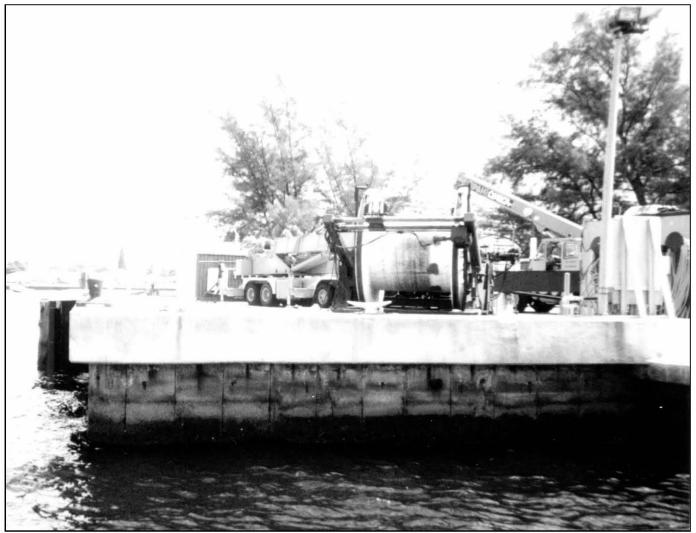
Example of Standard Vertical Concrete Bulkhead at USCG Fort Lauderdale
